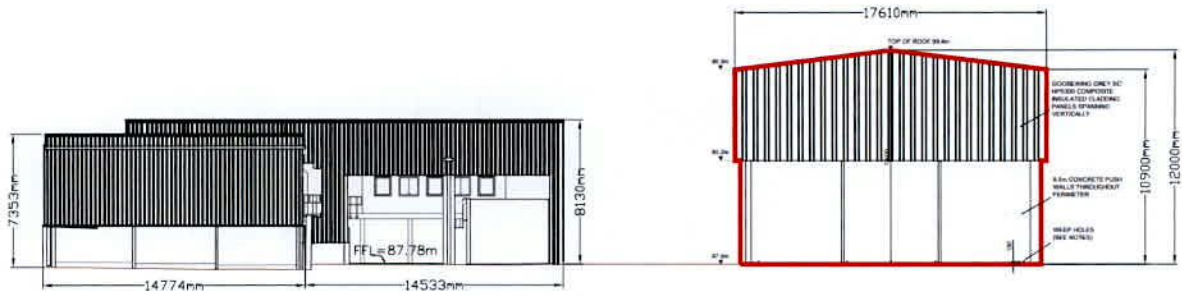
North Elevation – Existing and Proposed Development at Unit 518B (not to scale) (Outline of new building in red)
